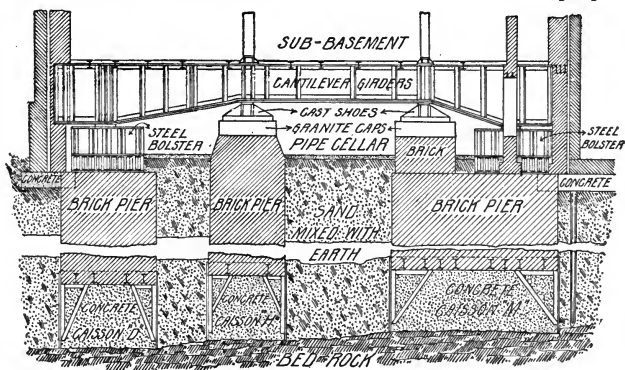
Cross-section of Caissons in Manhattan Life Insurance Co.'s Building, New York.
